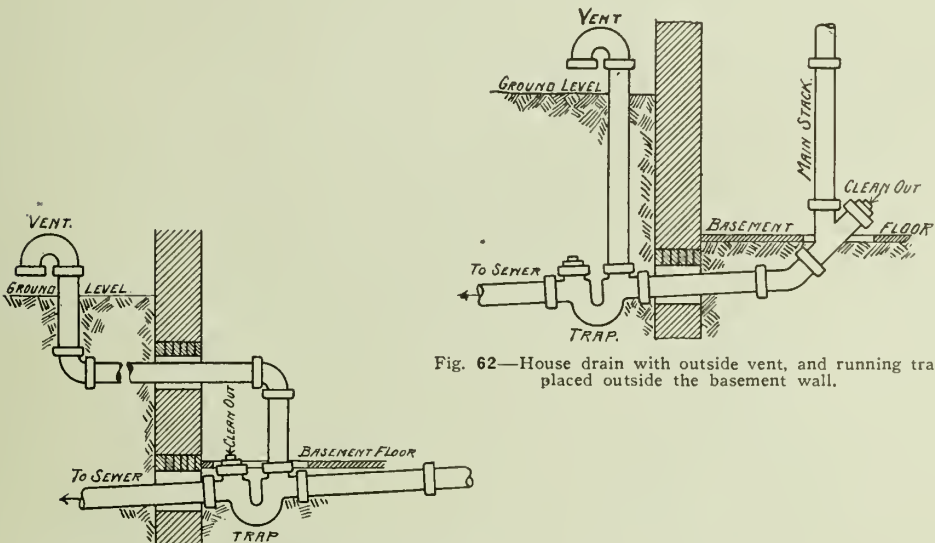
House drain with outside vent, and running trap placed outside the basement wall.
